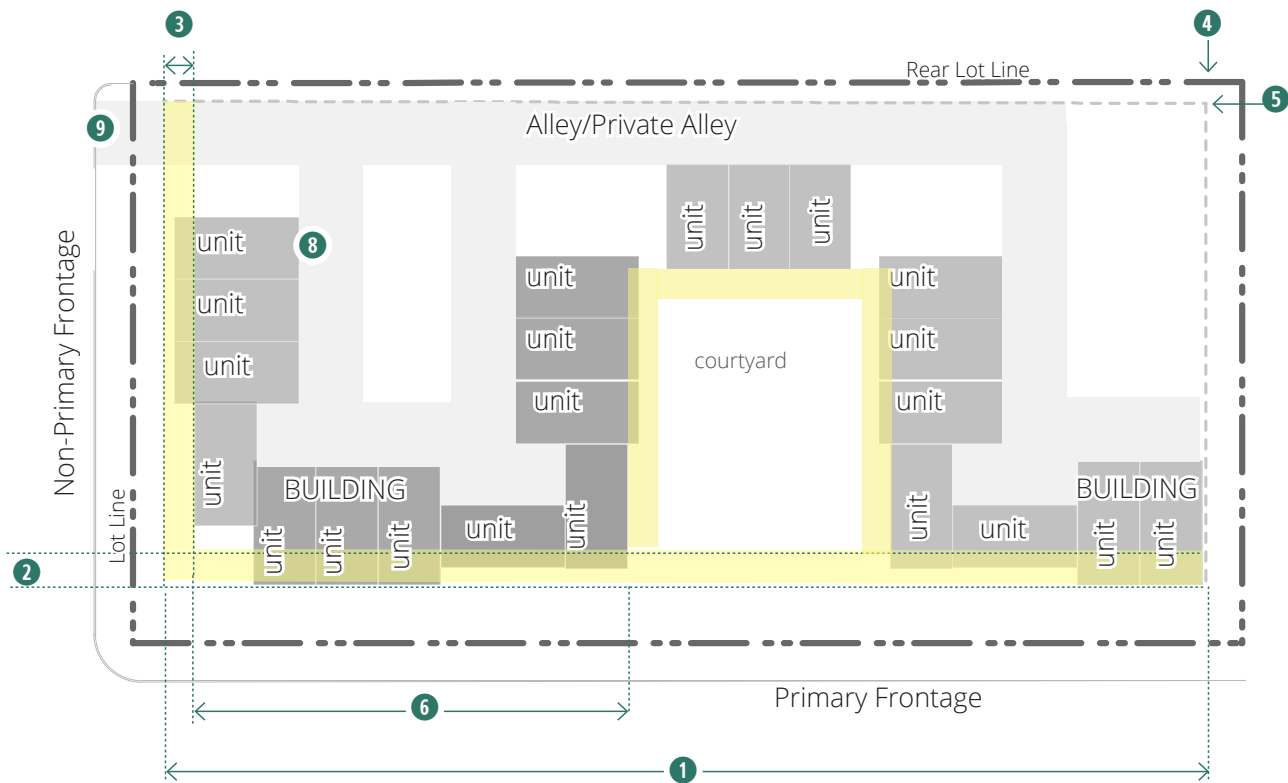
F-5. Row Building: Courtyard Layout Example
